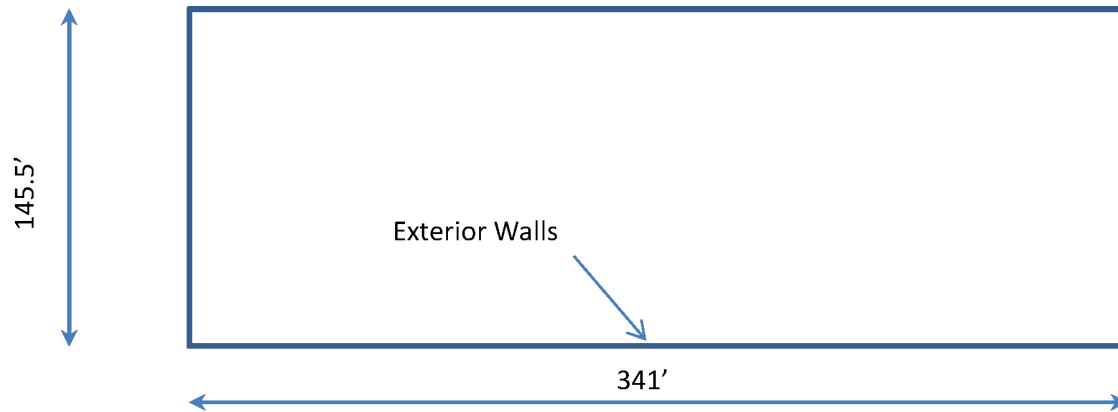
Plan View Dimensions of the Exterior Shear Walls
